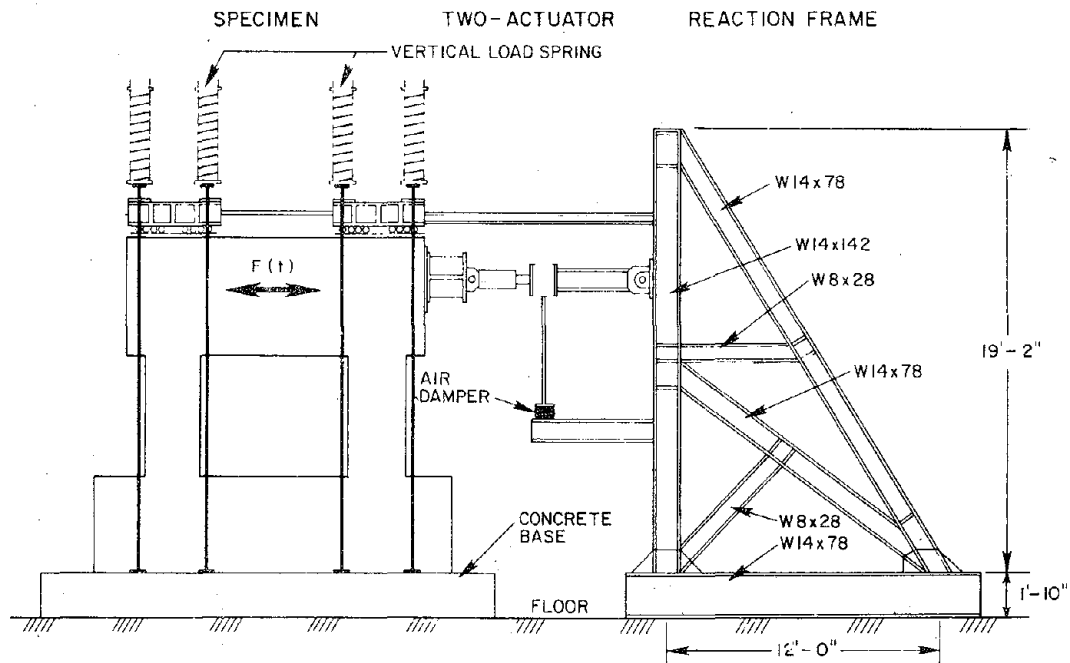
TEST SET UP FOR DOUBLE PIERS
